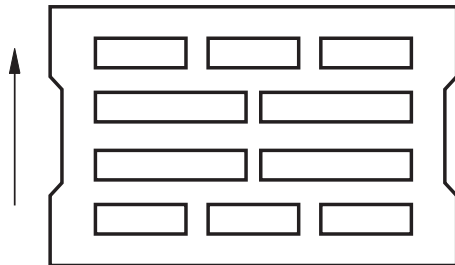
Lightweight concrete masonry units — Geometry 1,3/x
